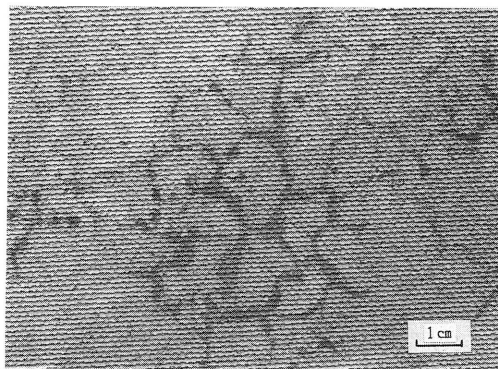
Quasi-hexagonal pattern formed on concrete surface
